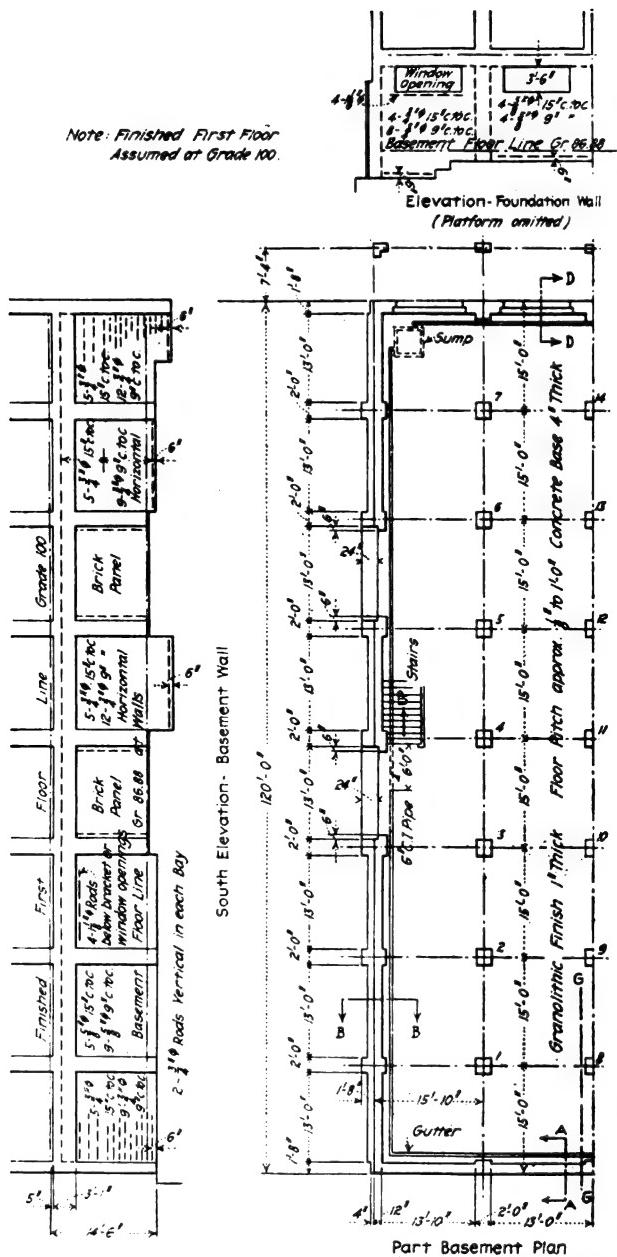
C.—Winchester Repeating Arms Co.'s building, New Haven, Conn.
